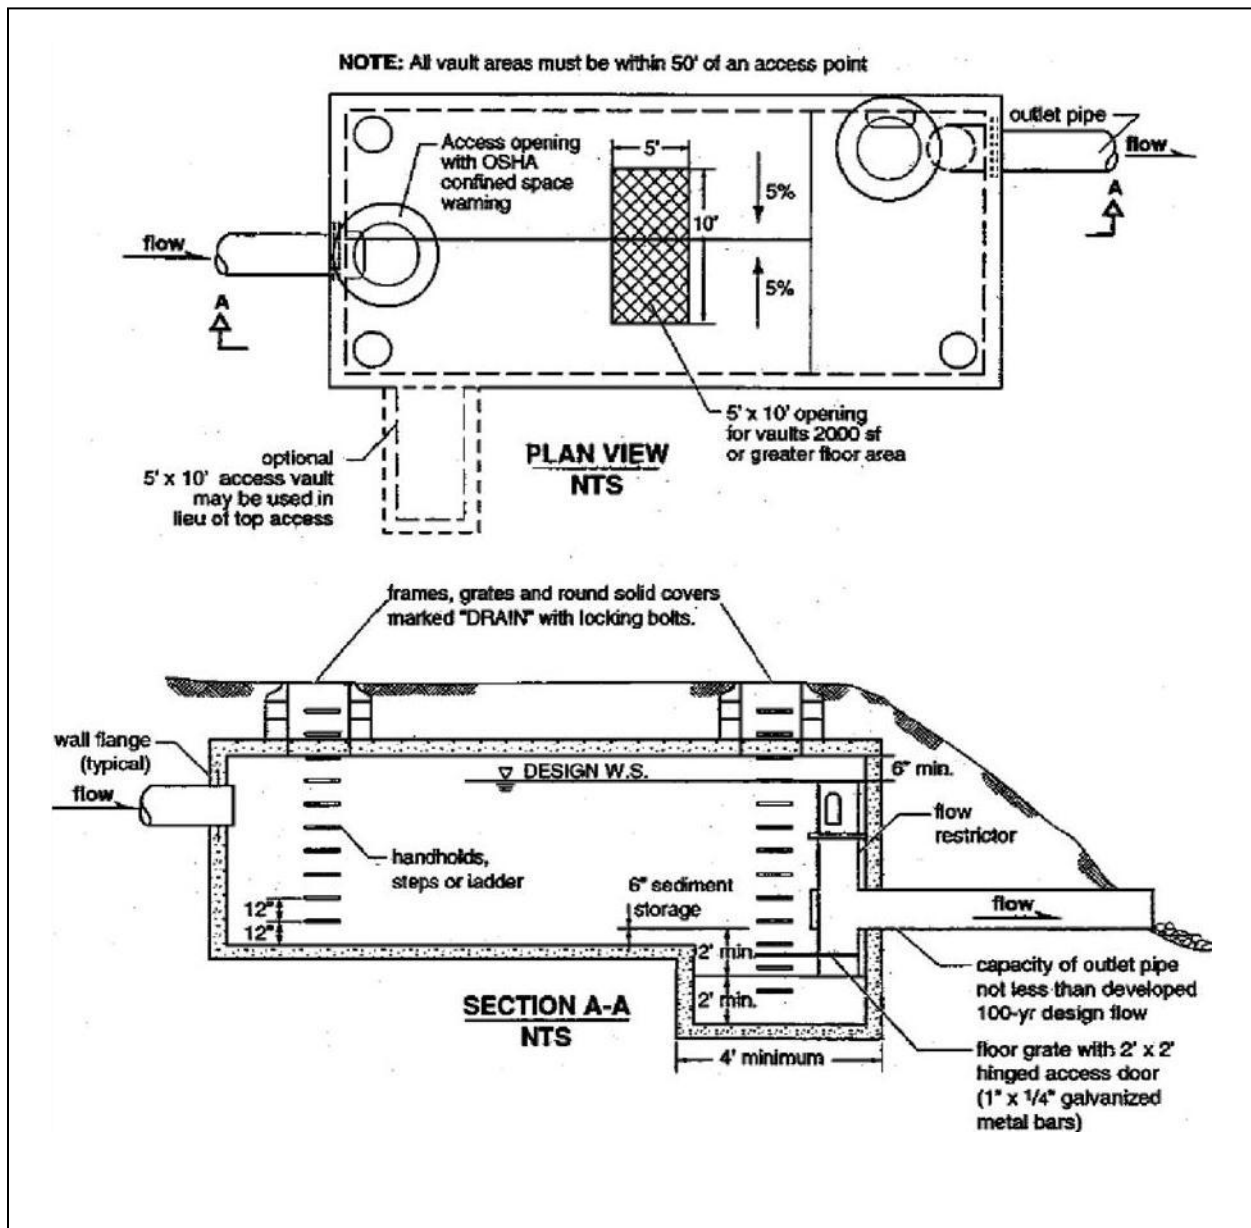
Schematic of Typical Underground Detention Vault
